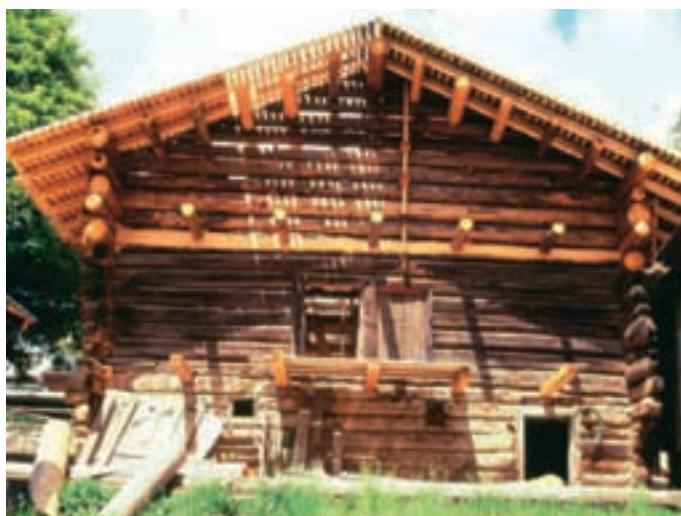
Example of wooden double roof frame with purlin and rafters (Val di Fassa).
